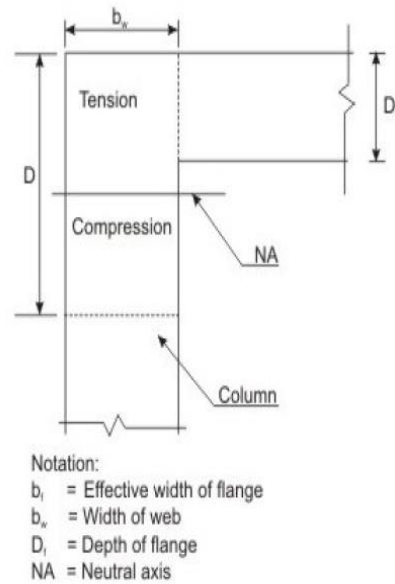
(f): Detail at 5 (rectangular beam)
